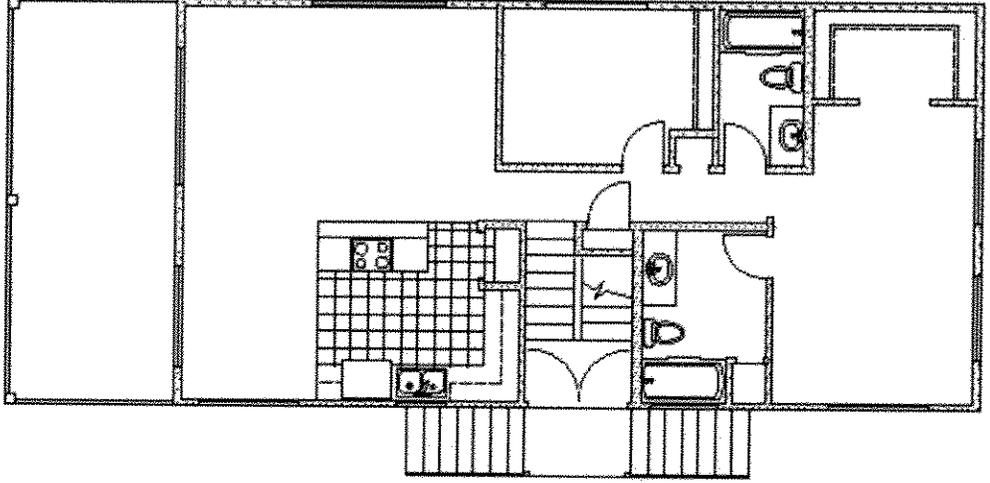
PROPOSED HOUSE LAYOUT
